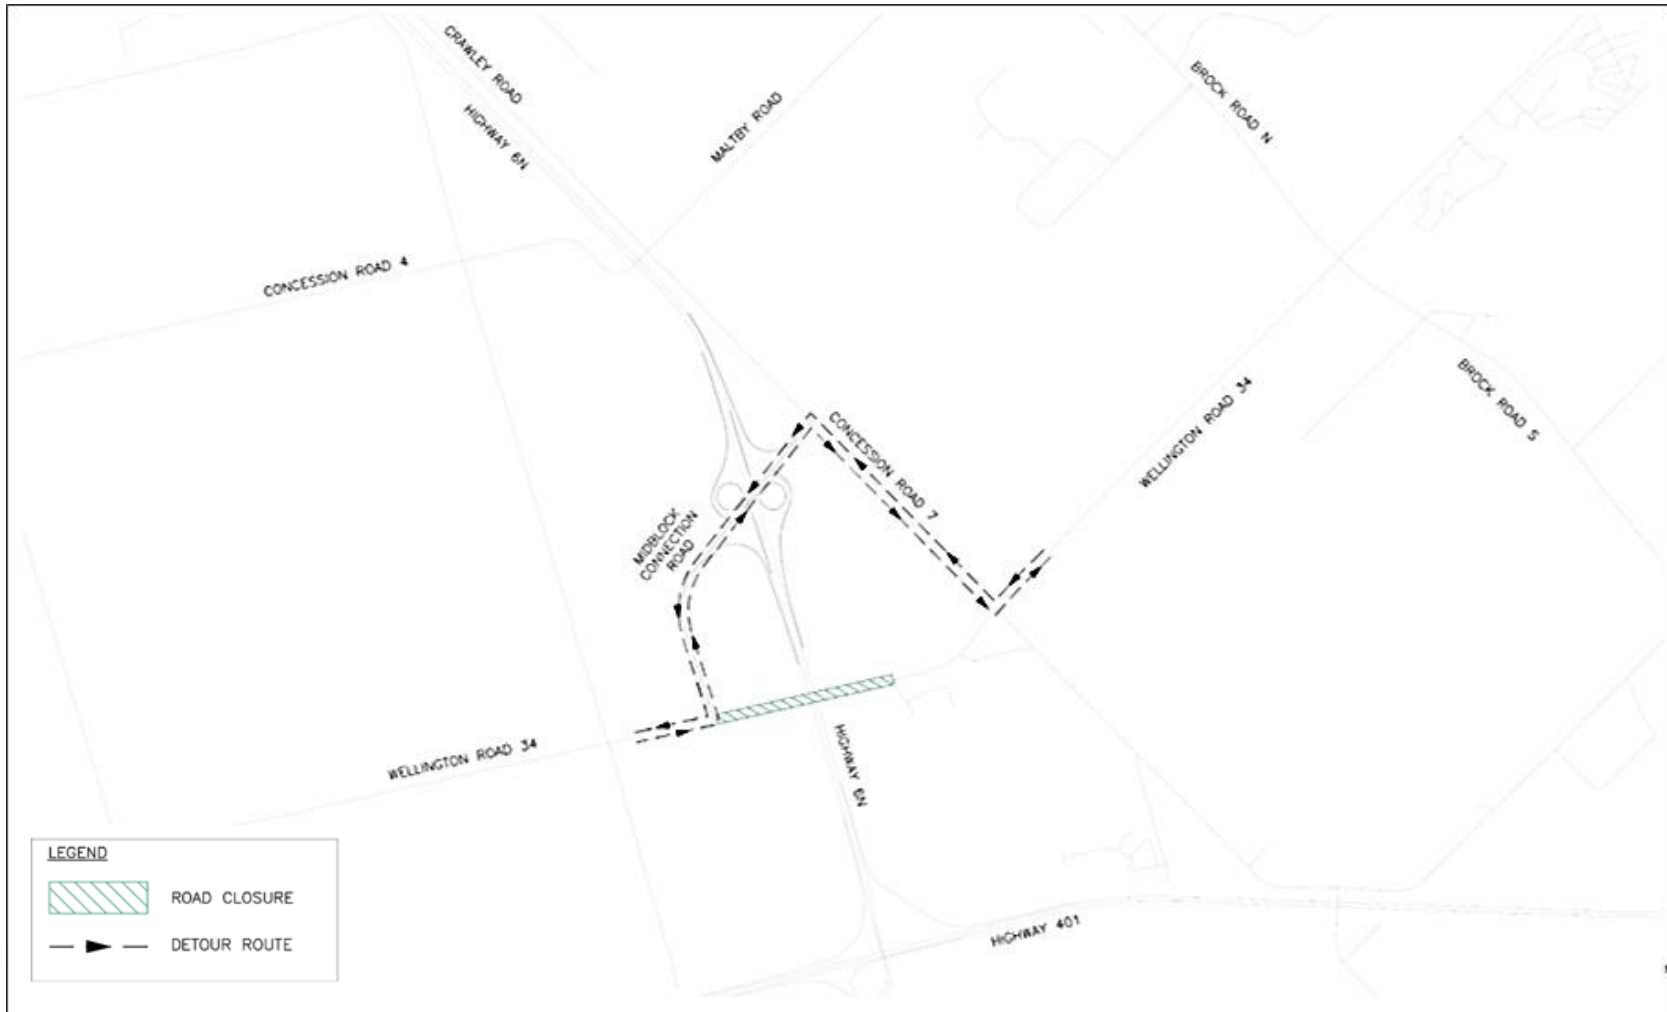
Detour Route for the Construction of Wellington Road 34 (Remaining Works)
